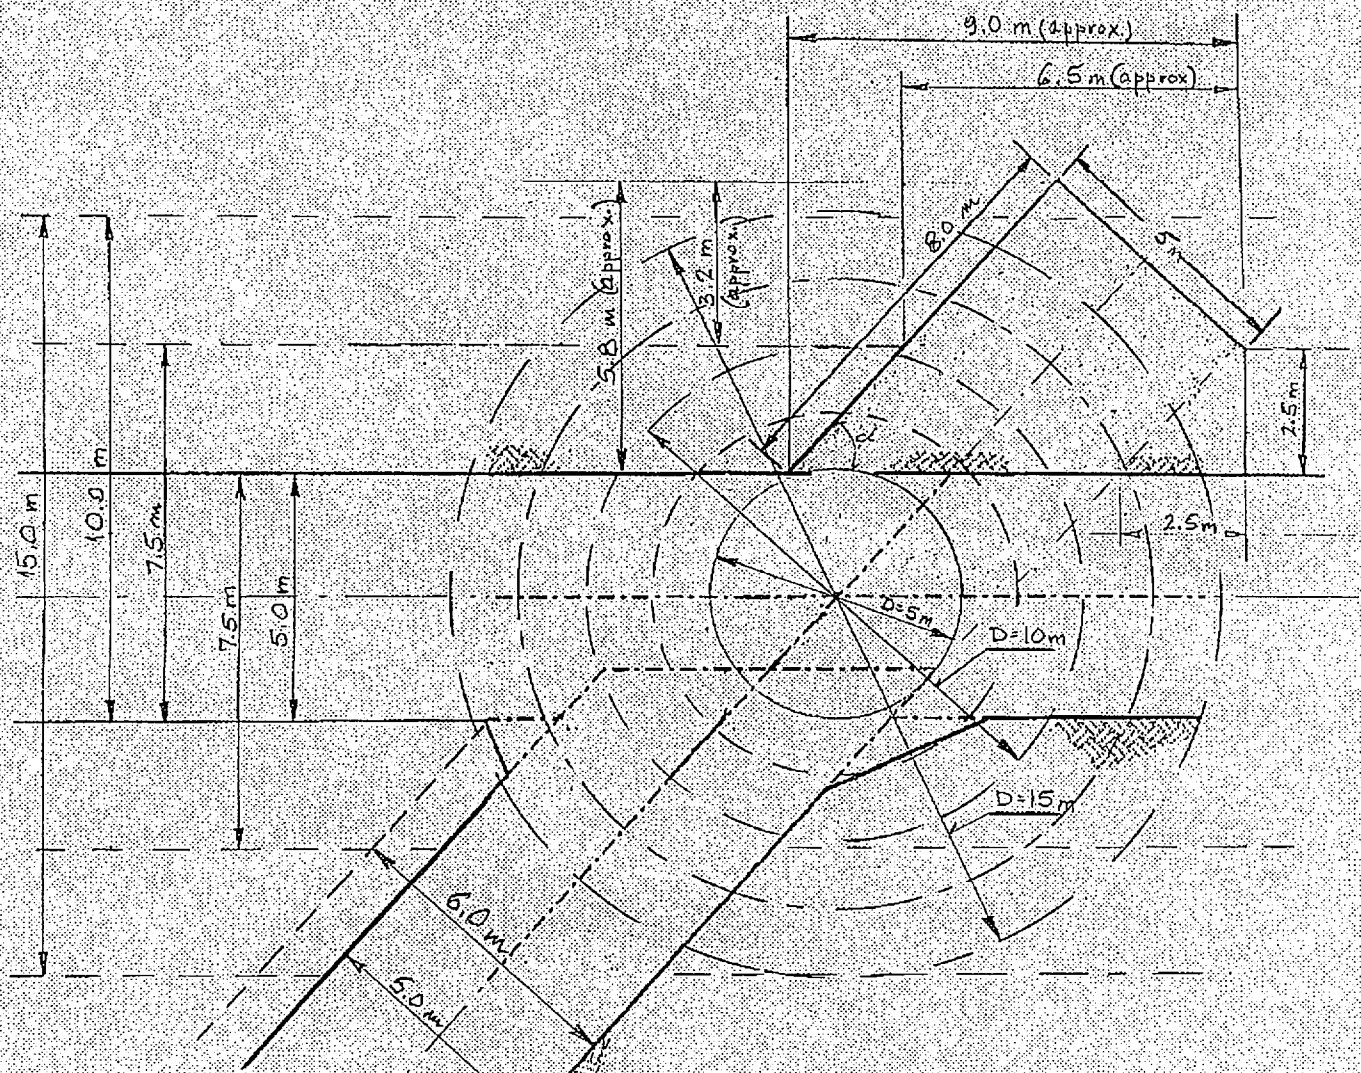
Typical ECRB Tunnel/Test Alcove Intersection with an Overlay of Roof Span Zones Ranging from 5.0 to 15 meters.
